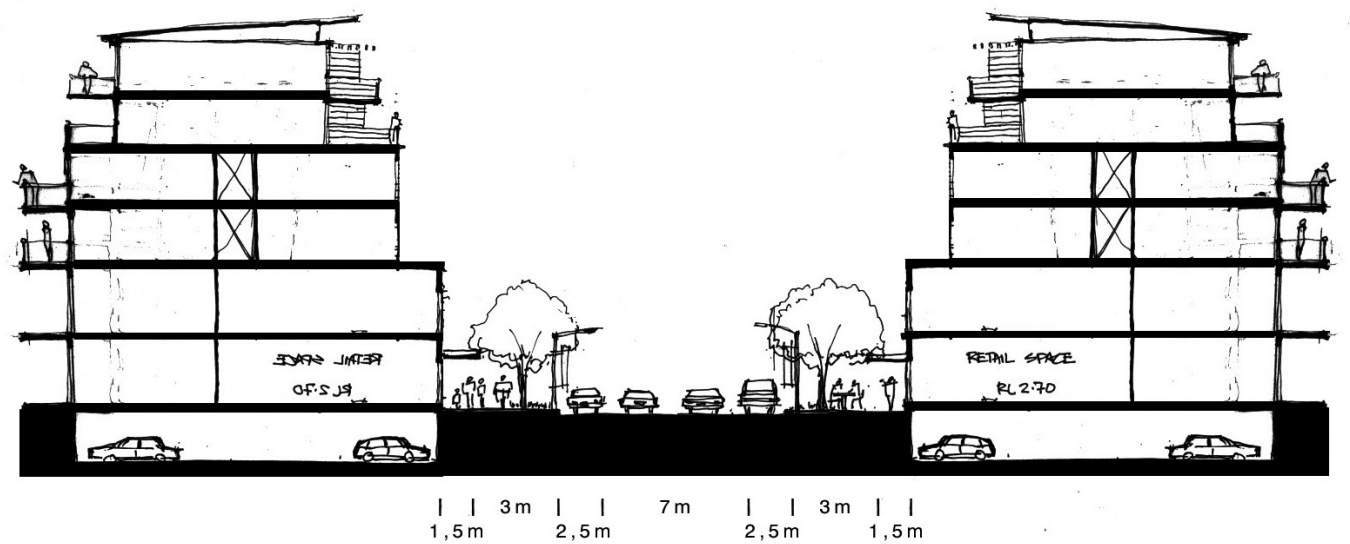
Indicative section showing upper floor setbacks along The Entrance Road for potential development to ensure solar access to adjoining buildings and streets
